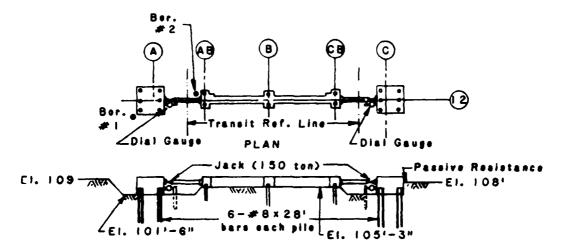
Load Test Data - Detroit Steel Mili (after Beatty, 1970)
